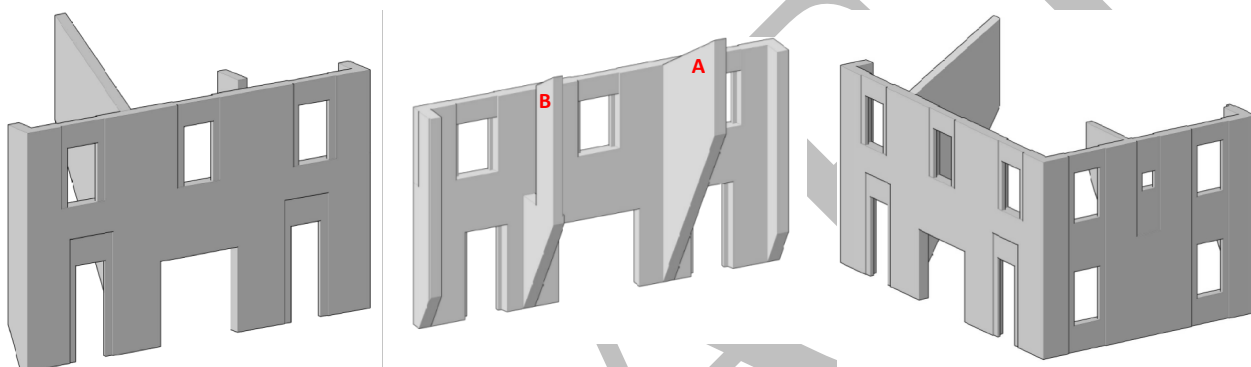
MBM models that take into account the presence of a good connection between the walls
